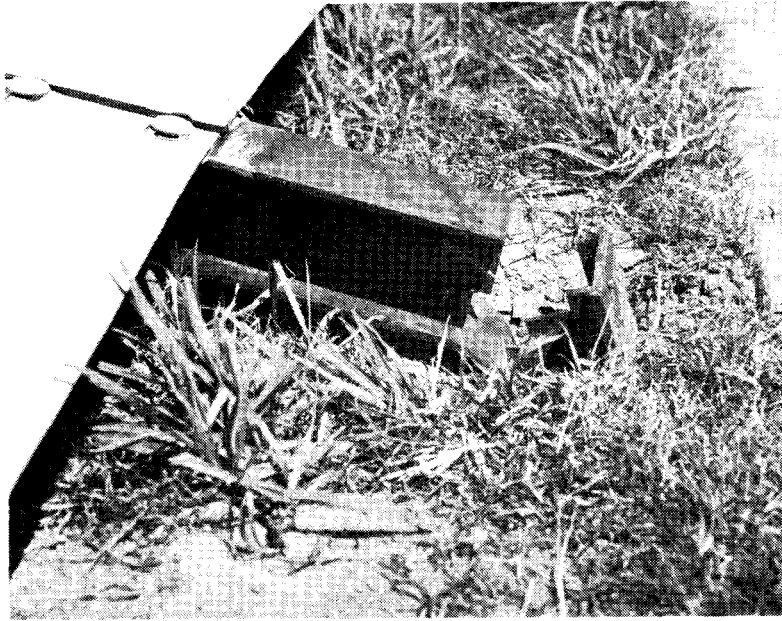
, W₁ in First Guardrail Bent Over at Weakened Section
